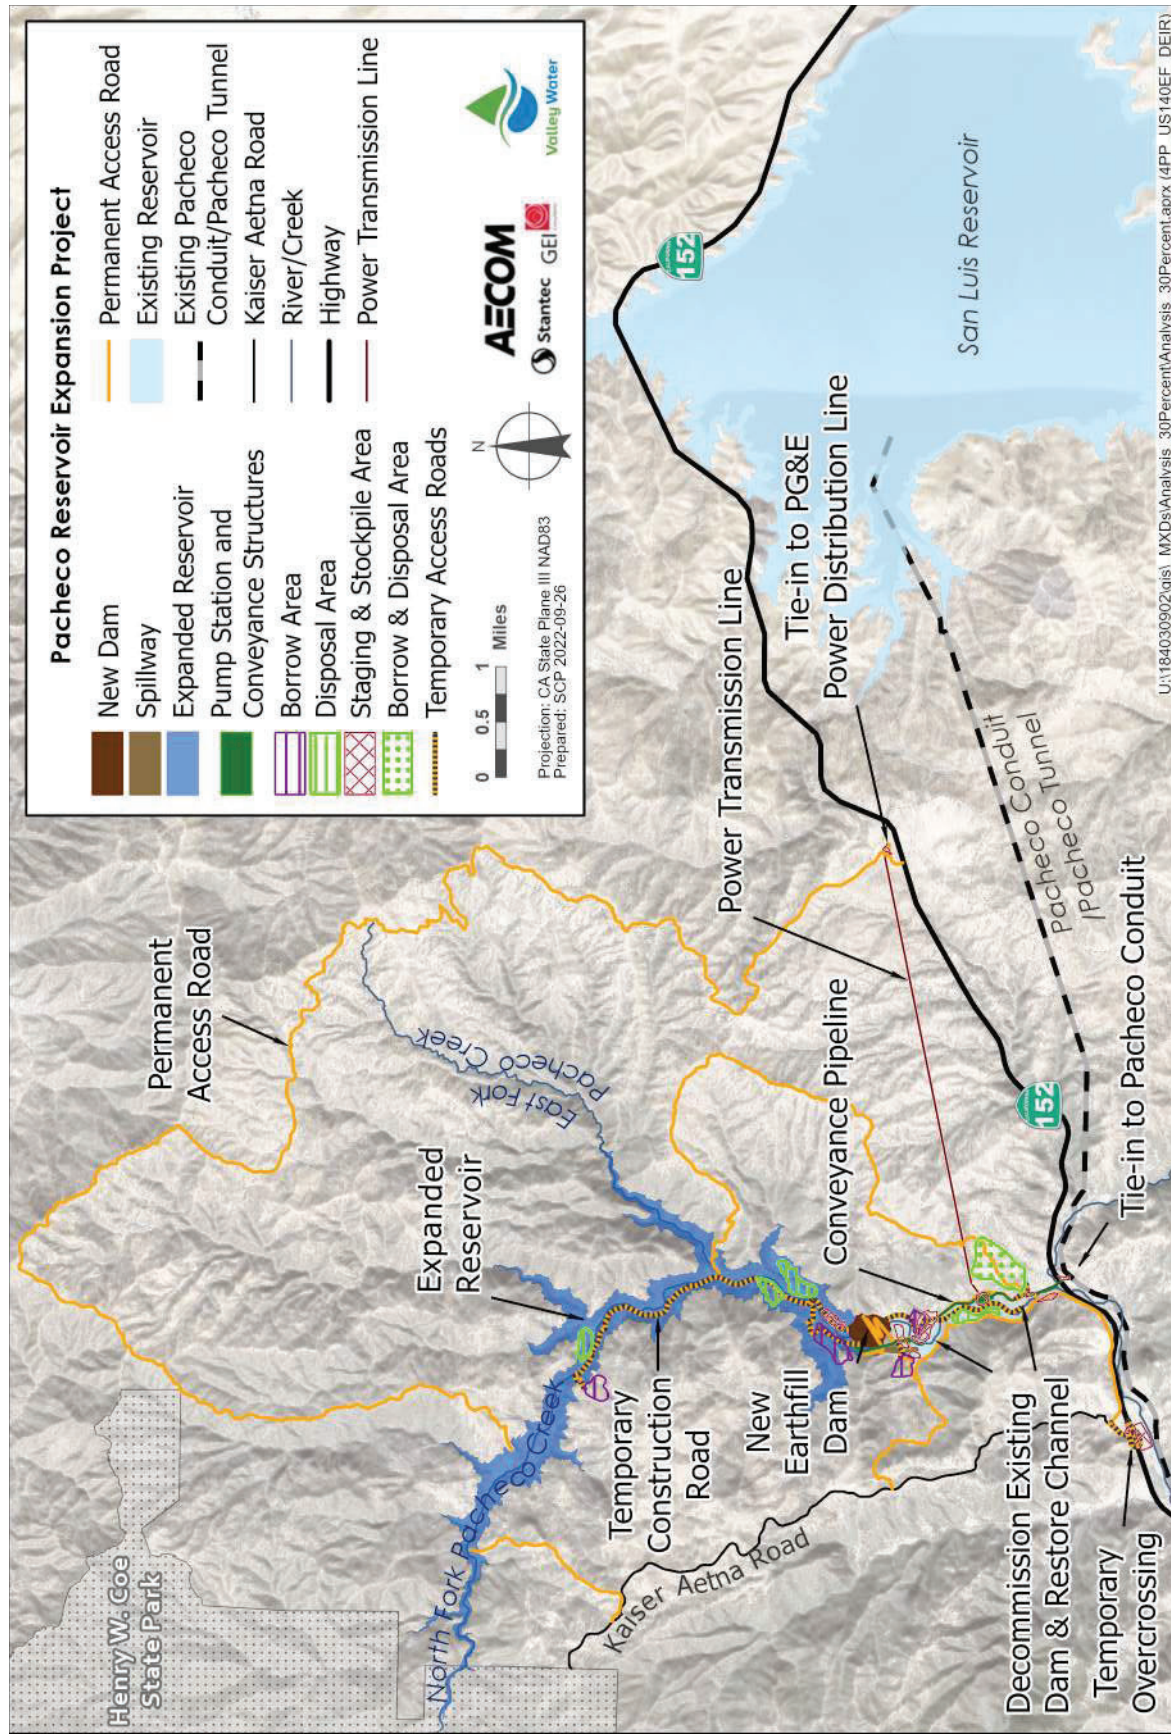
Temporary Roads and Borrow, Disposal, Staging, and Stockpiling Areas for the Staff Recommended Alternative
